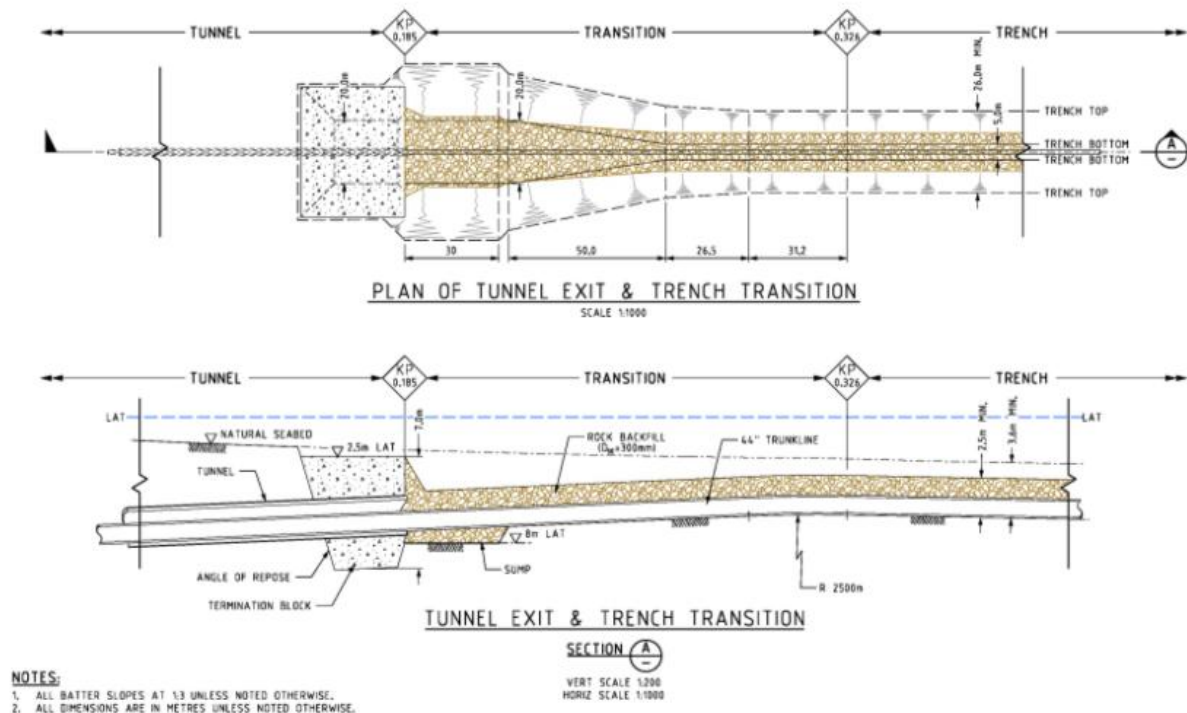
Drawings of the Tunnel Exit and Trench Transition
